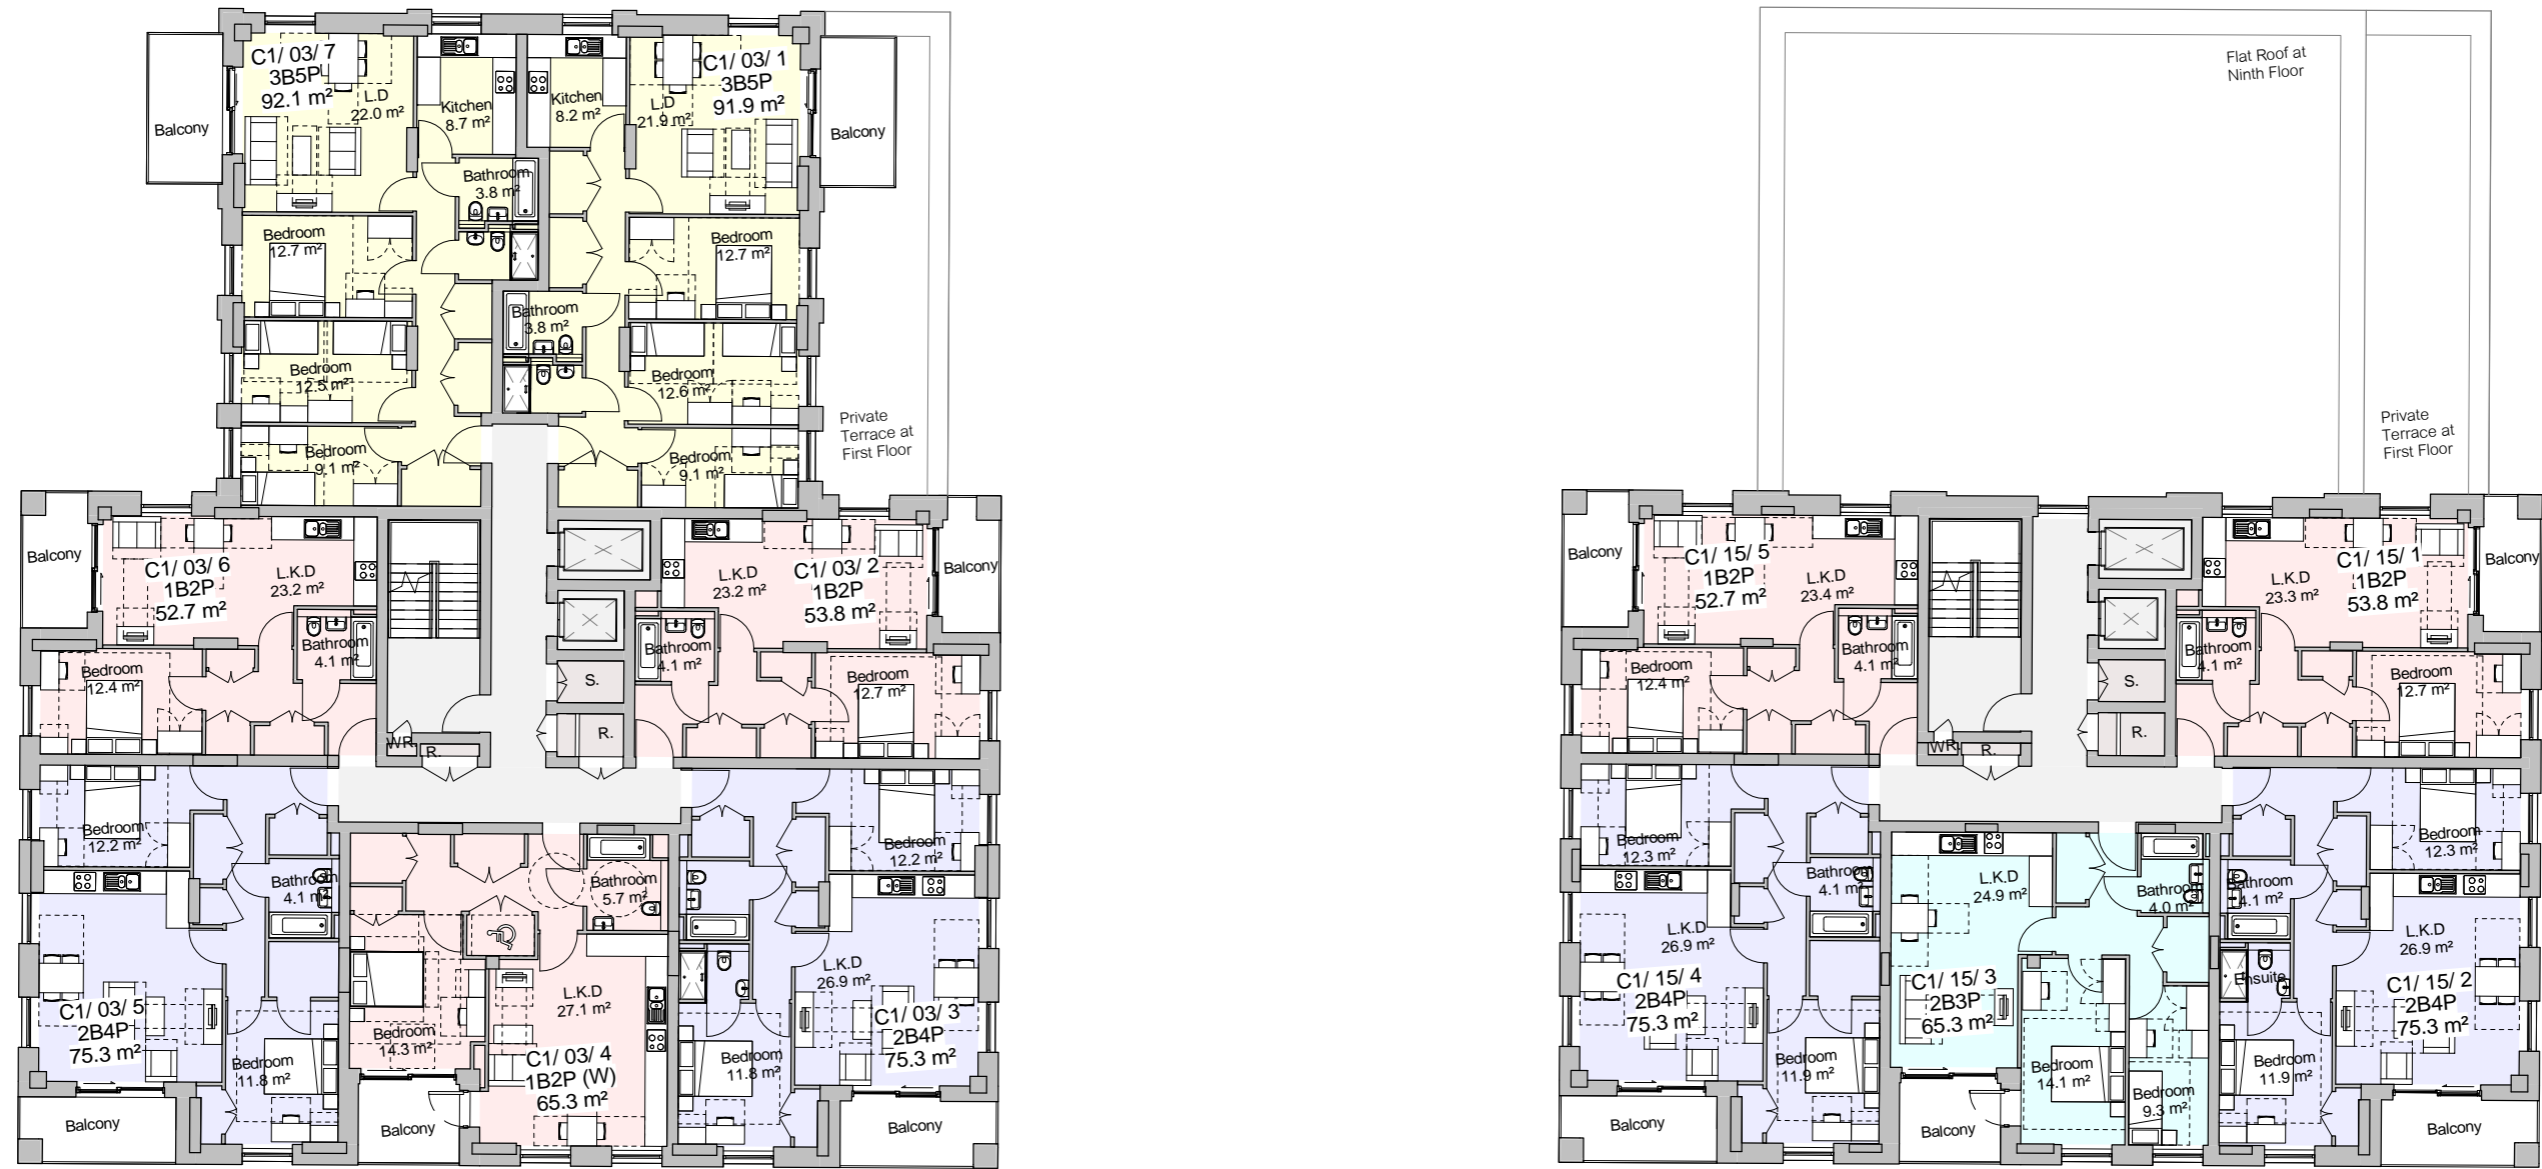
BLOCK C TYPICAL LOWER AND UPPER FLOOR PLANS
